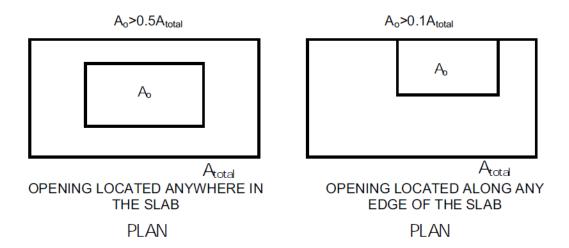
Opening in Slab [Courtesy: IS 1893 (Part-1): 2016]
